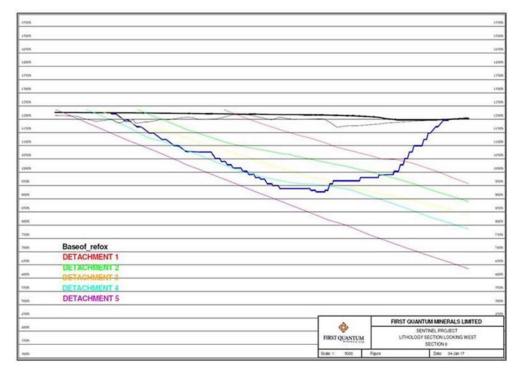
Cross section through design footwall slope, as per 2015 design parameters
